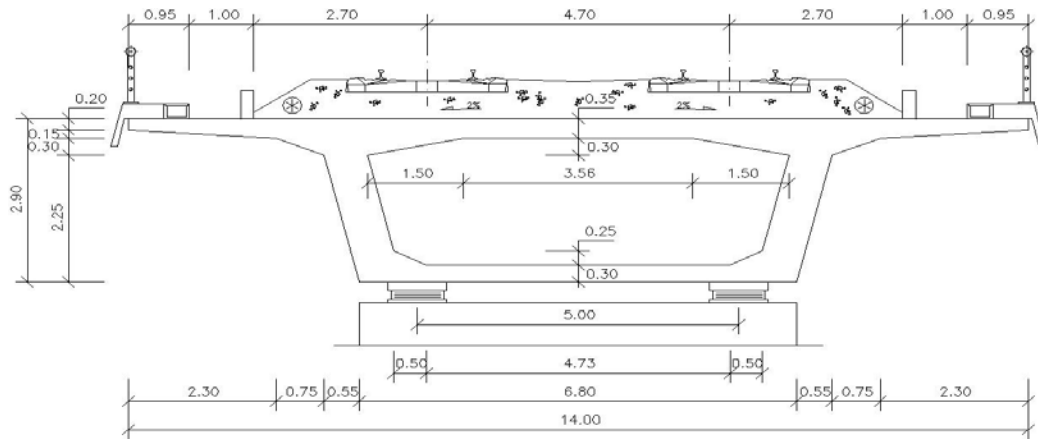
Deck-section considered for the 50 m span railway viaducts
